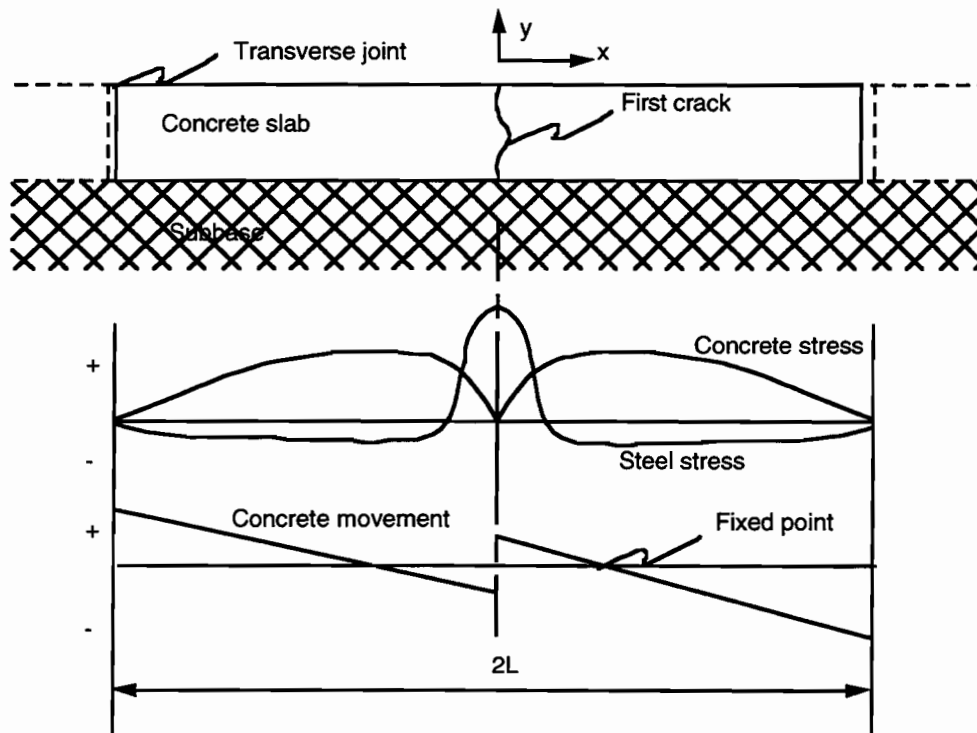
One-crack situation for jointed reinforced concrete pavement (JRCP)
